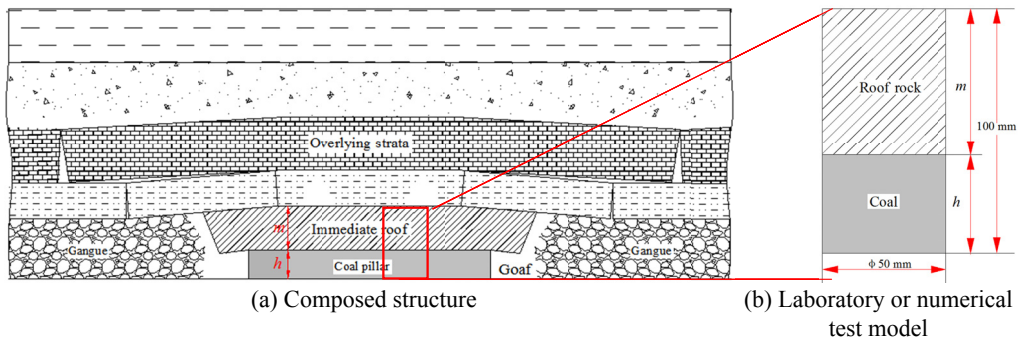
Composed structure, laboratory or numerical test model of roof rock-coal pillar structure body
